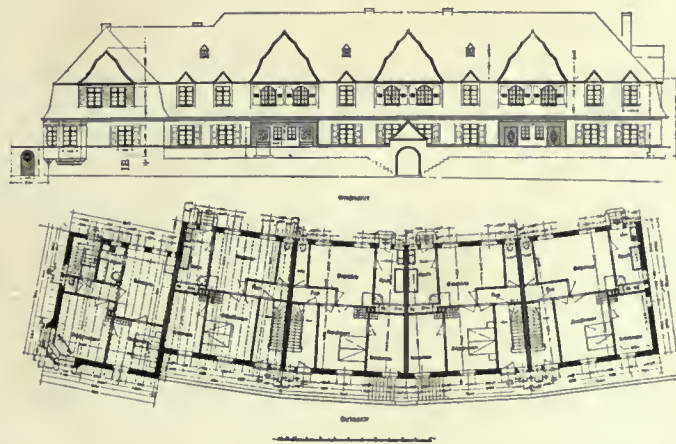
Elevation and Plan of Five-house Group on Stensstrasse
